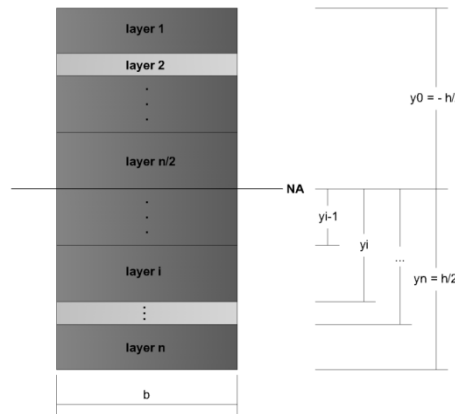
Rectangular cross section of the bridge's elements divided into layers
